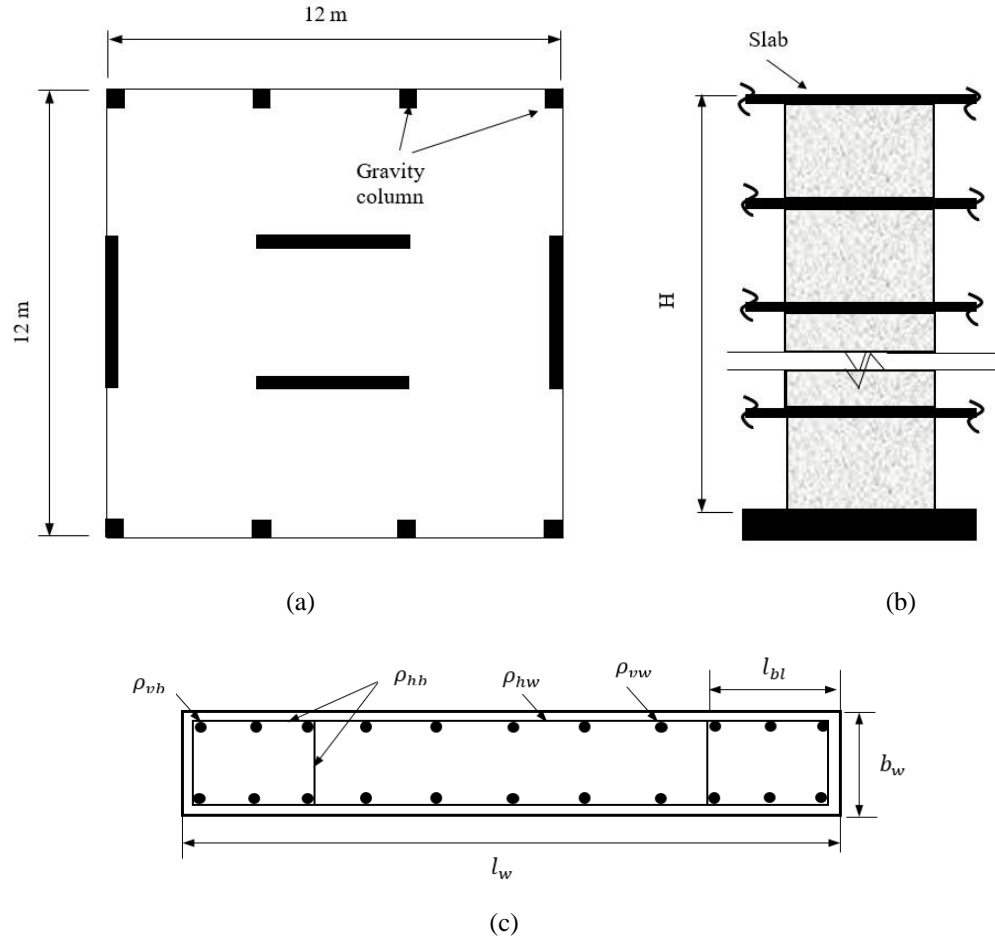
Considered building (a) structural plan; (b) wall elevation; (c) typical wall section
